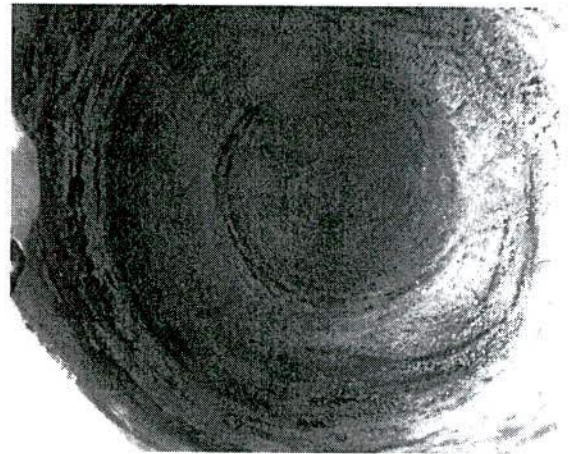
Failure pattern of ground treated by sand bed with geotextile and sand column.
